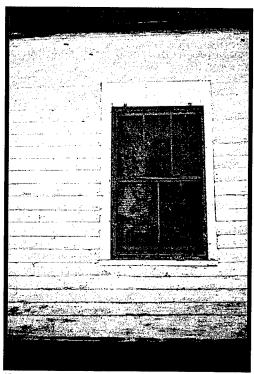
A detail of a window along the front (western) elevation of Standing Structure 55-1113. Note the paned (3/2) glass.
